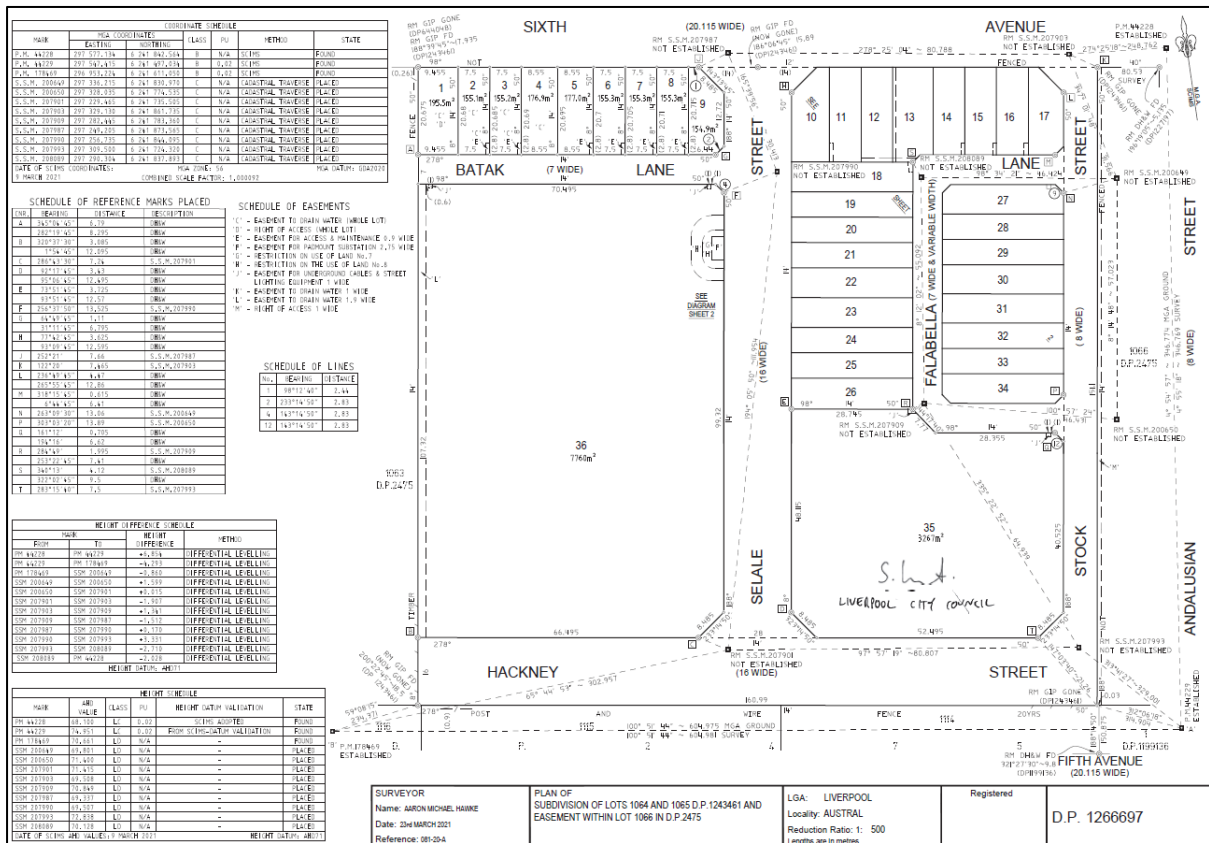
Approved Plan of Subdivision (SC-71/2021).
